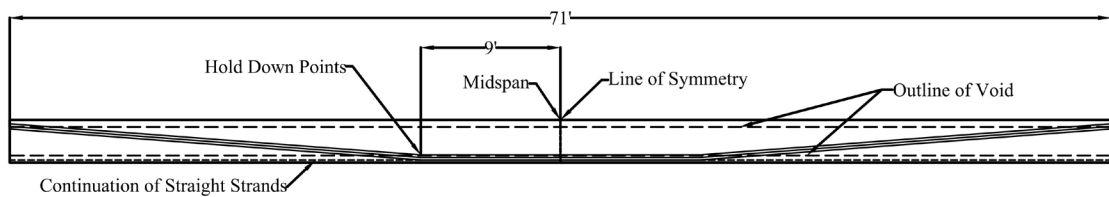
Essex Bridge beam strand layout (side elevation)
